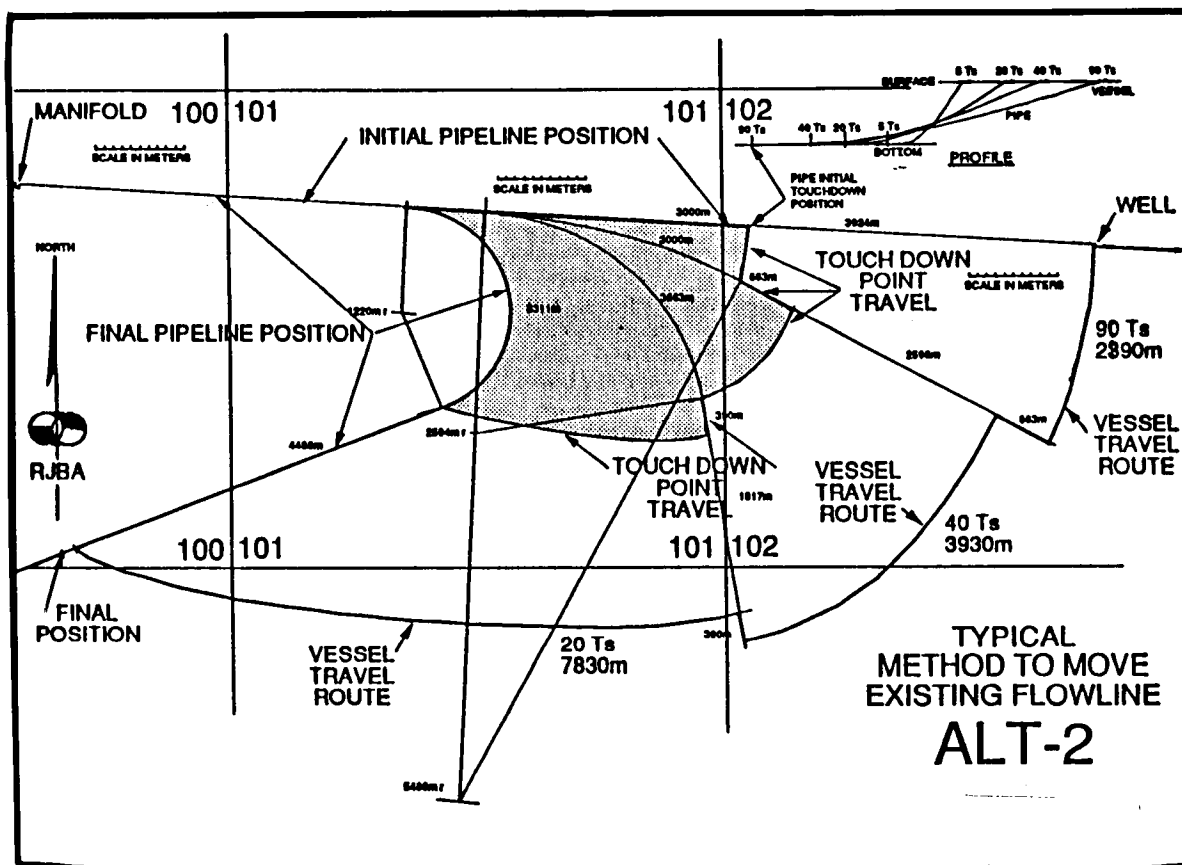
Repositioning of a 7-mile pipeline in which the pipe end is moved a distance of 7 miles.
